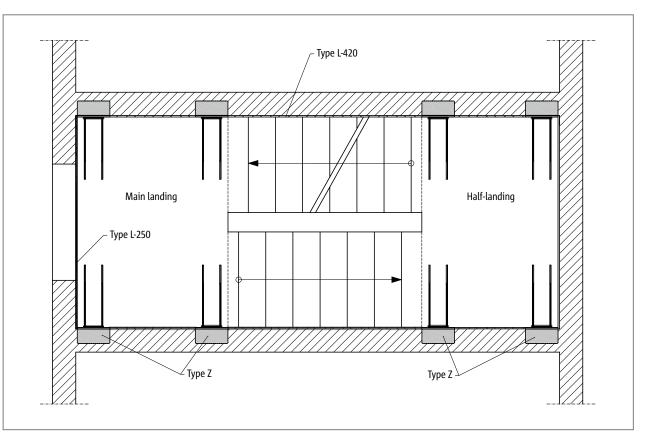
Schöck Tronsole® type Z: Element configuration in plan view
